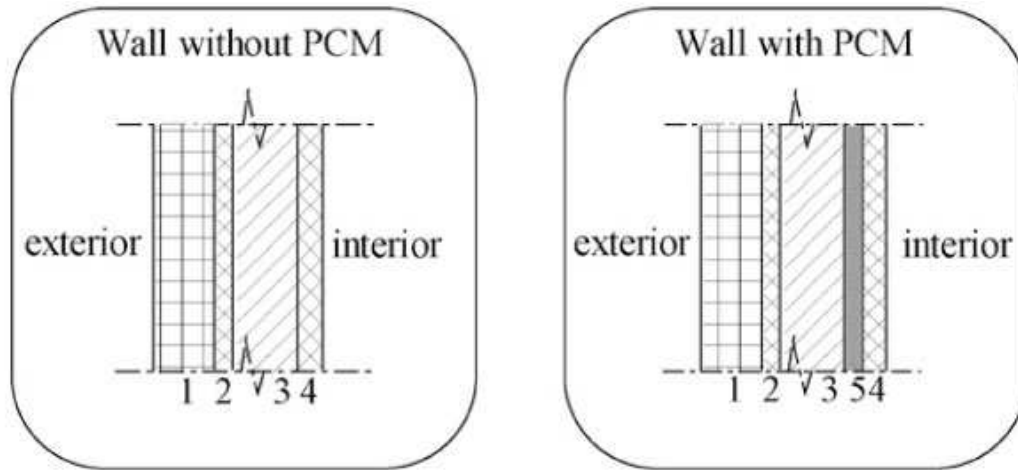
Wall compositions in Kuznik, Virgone & Roux's experimental test rooms. 1 – 50mm wood plate; 2 – 10mm plaster; 3 – 50mm polystyrene; 4 – 13mm plaster and 5 – 5mm PCM
